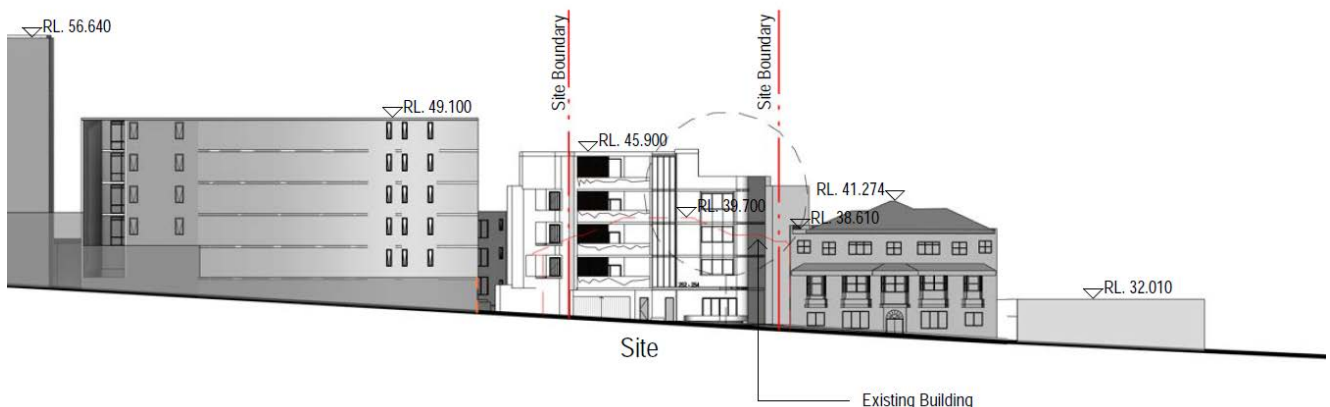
Concept scheme – New South Head Road elevation (source: Antoniades Architects)
